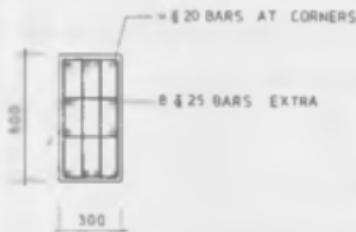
Design of rectangular column section (Ghanekar and Jain⁷⁸)
